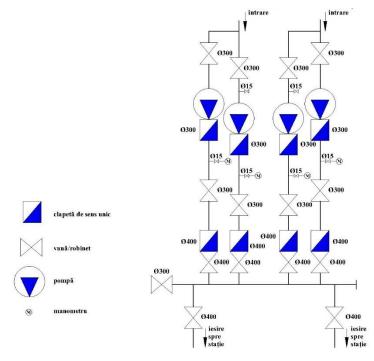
Hydraulic Scheme with existing equipment of Pump Station Stage I
